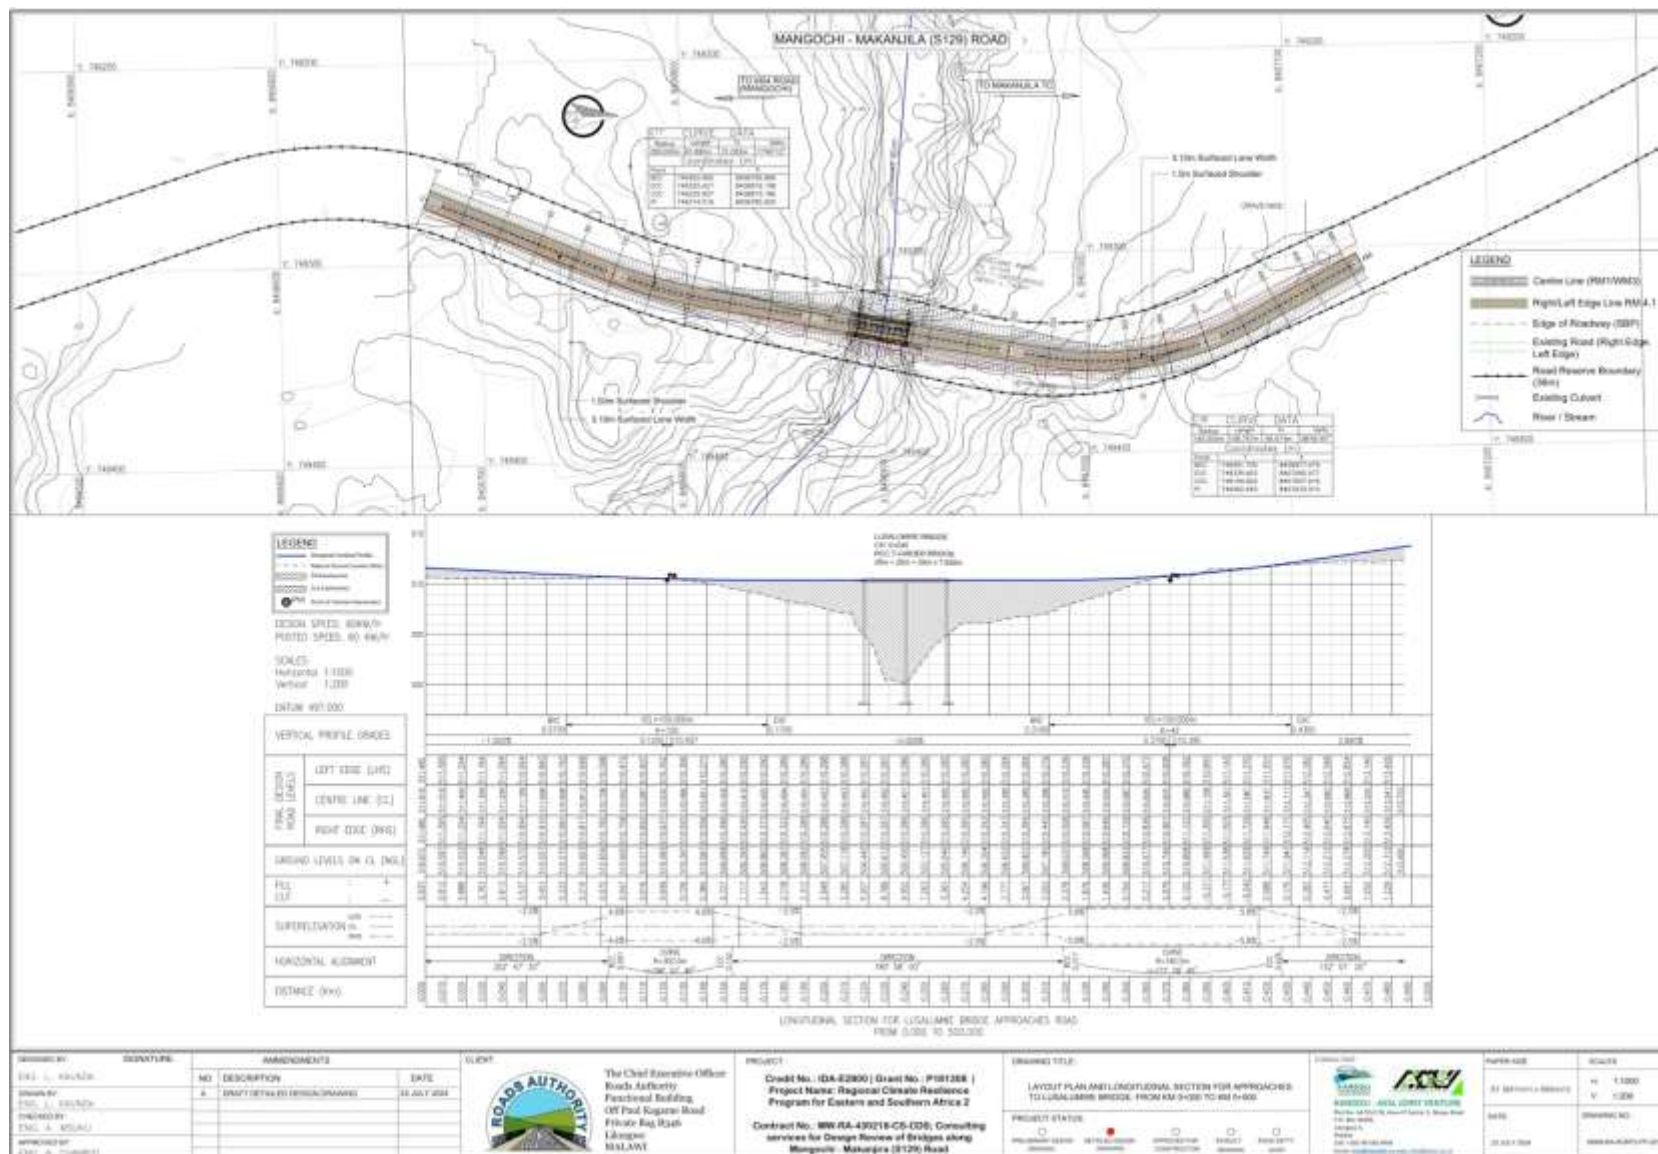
Lusalumwe Layout Plan and Longitudinal Section for the Road
